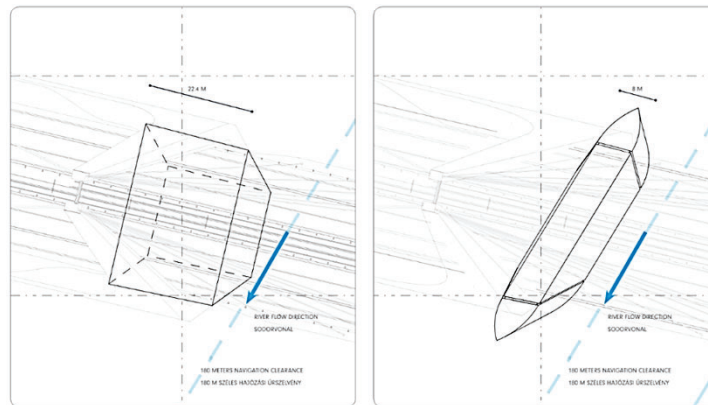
River pier geometry. Left – Original competition, right – final pier design – © UNStudio
